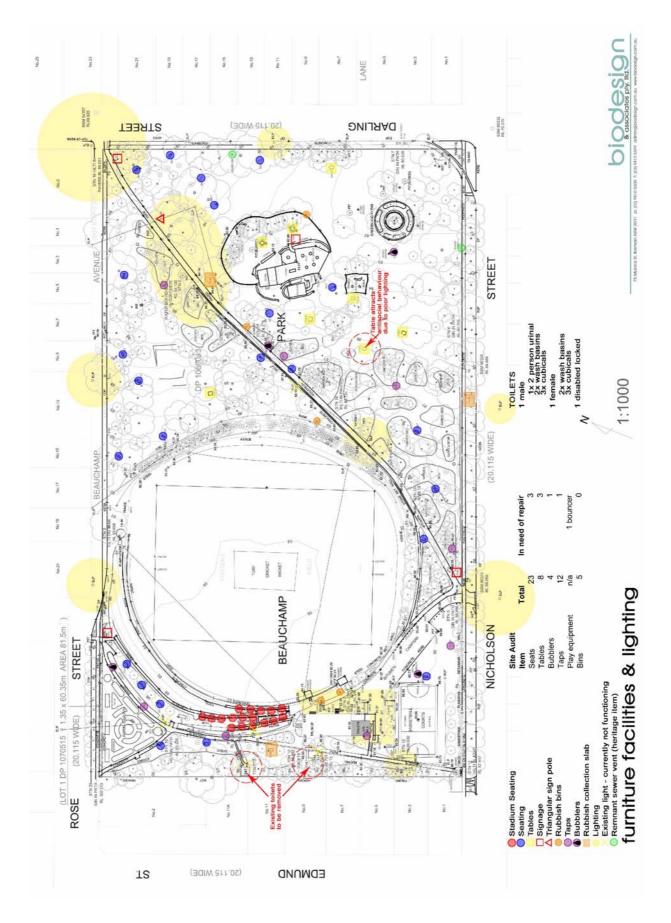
Plan showing locations of furniture, facilities and lighting at Beauchamp Park.
